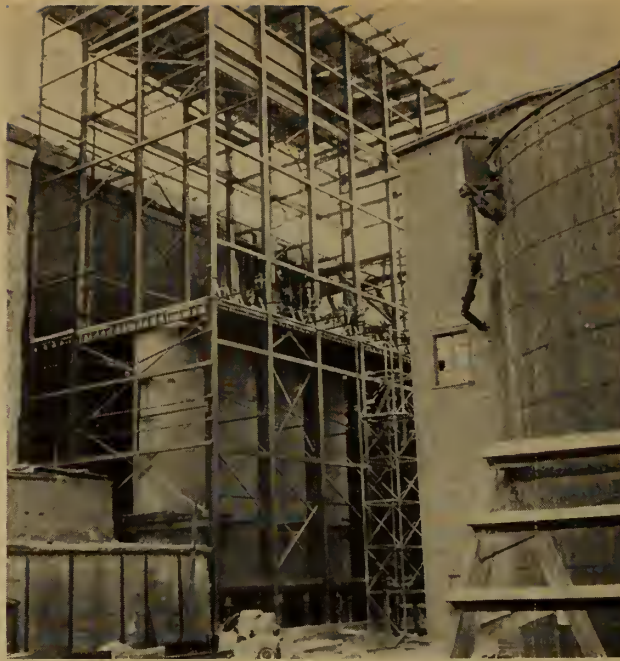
Extension to the digester building to house six additional digesters. The chip bin had not yet been installed.
